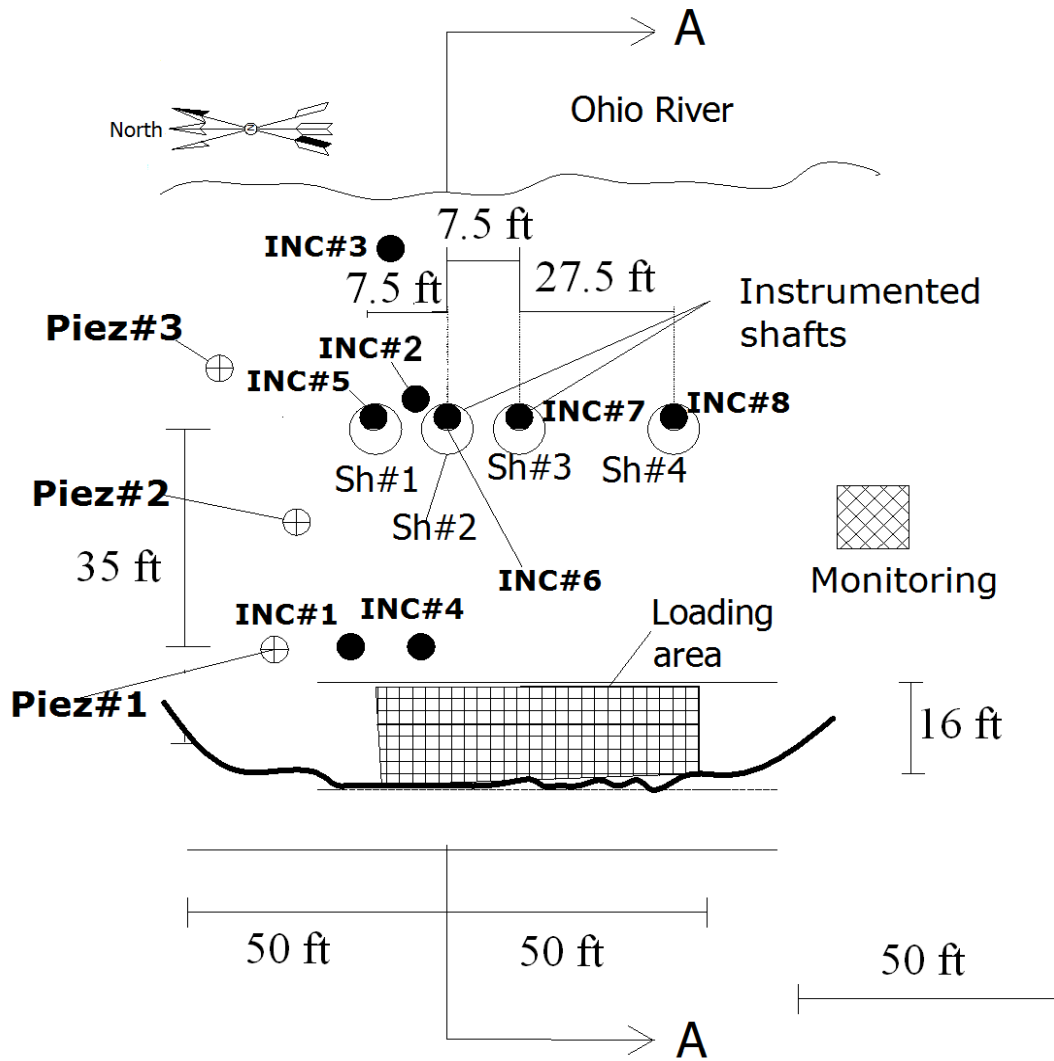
Plan View of ATH-124 Test Site and Instrumentation Layout
